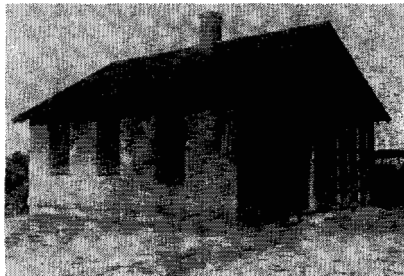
“During the summer of 1927 an office and garage building 22 by 24 feet was constructed. The cost of the building was \$900. The building was constructed with the garage on the east side running the entire length.”
